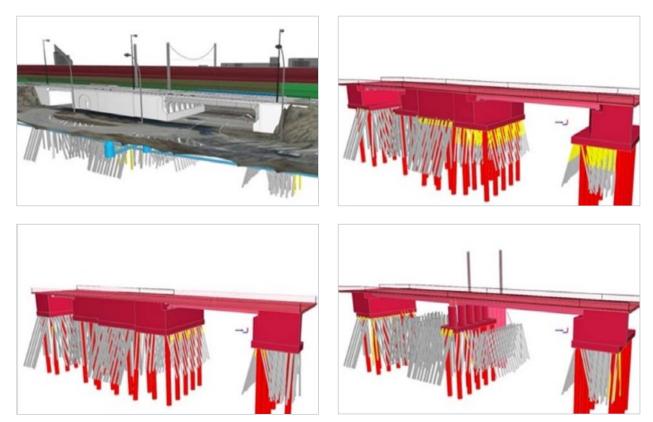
Study of variants of structure 16b Am Bahndamm and structure 17b Tunnelstrasse (source: HPA/Schüßler-Plan)
